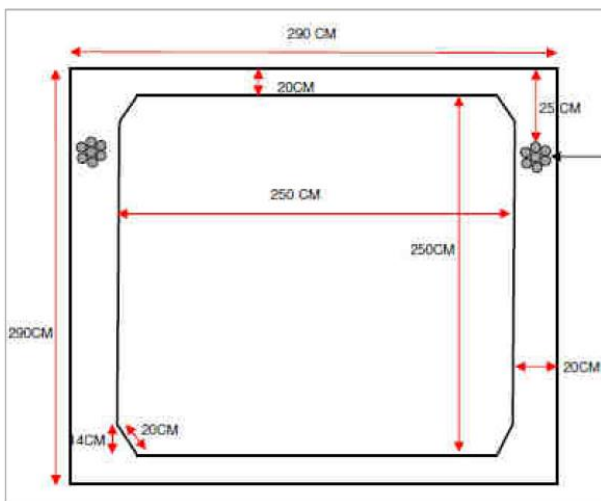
Typical cross-section of the culvert Schaapswegduiker
